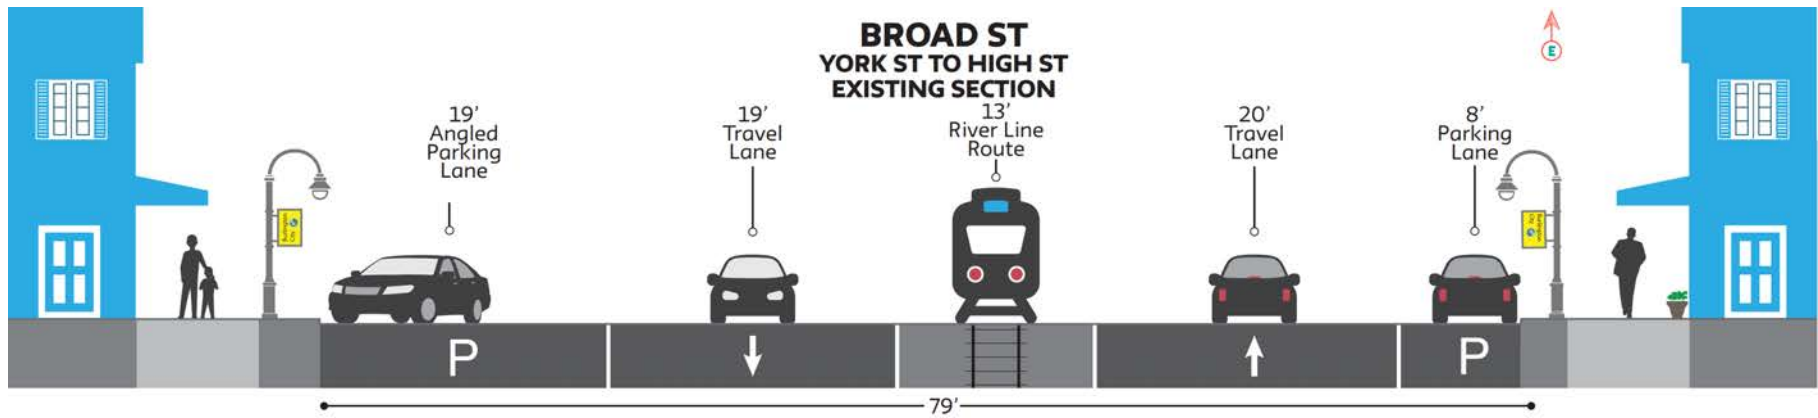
Existing Cross Section Broad Street - York Street to High Street
